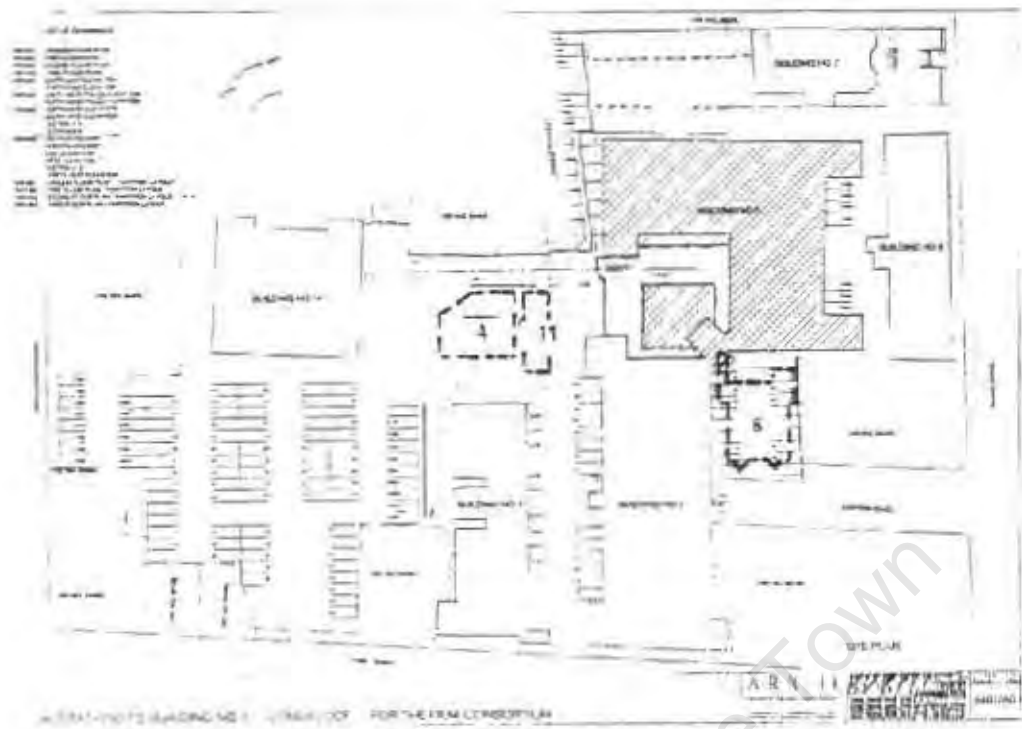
/13 Plan of 1990 indicating the parking after the conversion and the location of the buildings on the site that were demolished to increase the amount of parking space: storage area (Building 4), substation (Building 11), 'Benmore' house (Building 6) (Source: Piet de (eer)
